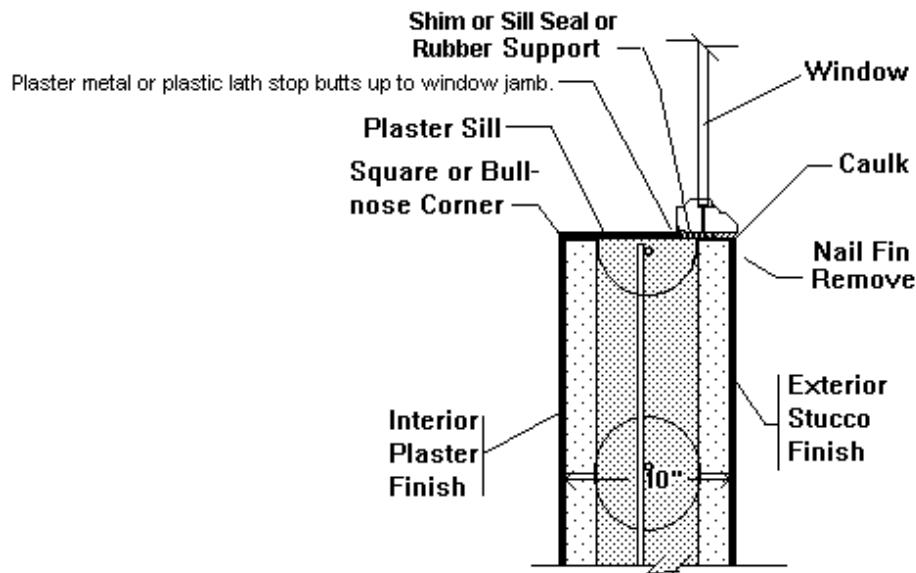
Window installation using plaster sill over RASTRA® end element.
